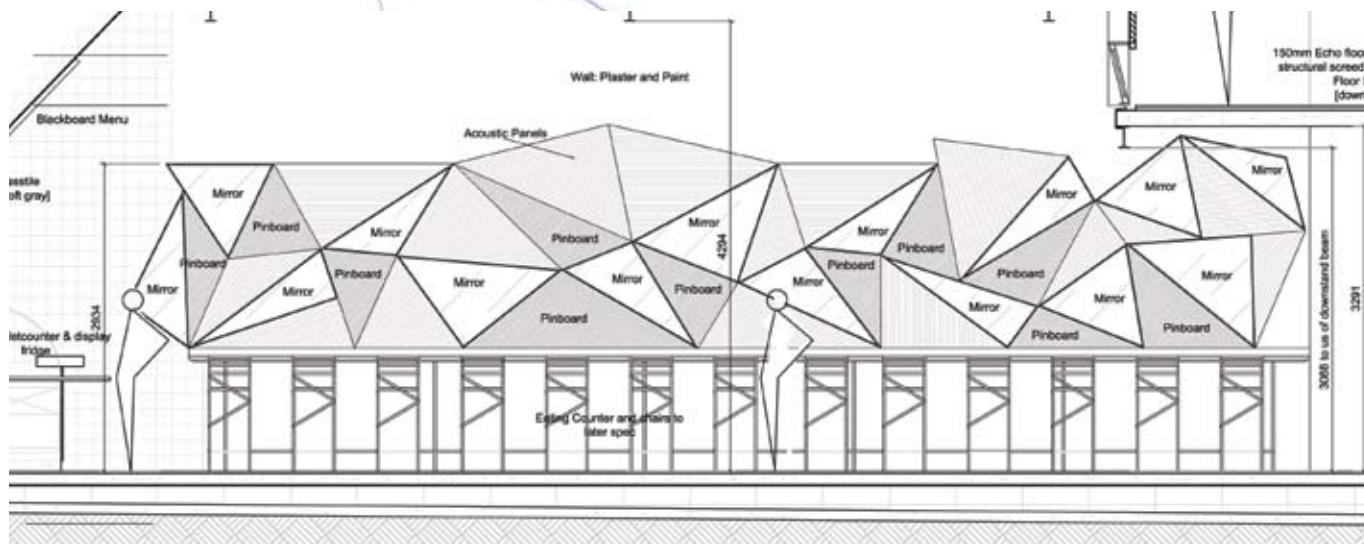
Elevation of fractal wall detail in Food Outlet Area
